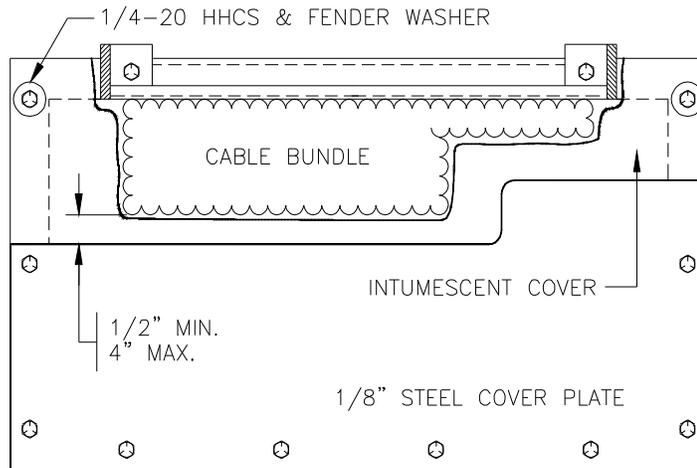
CABLE HOLE SET-UP FOR COMPOSITE SHEET PRODUCTS
